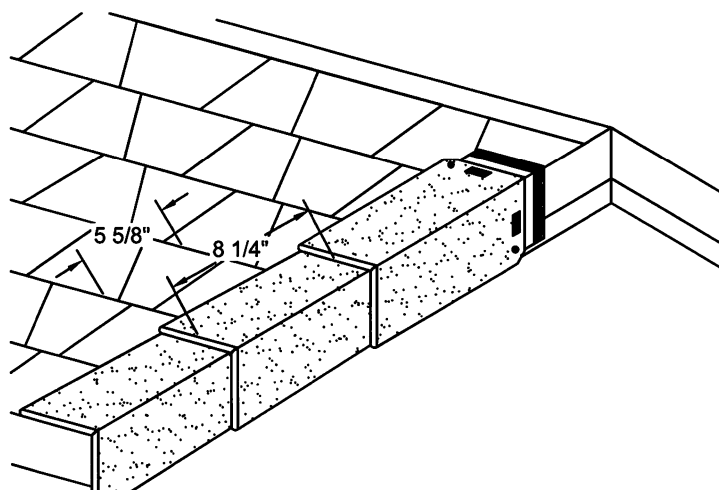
Installation of EZ-Ridge™ Shingles on Rake Edges of the Roof
